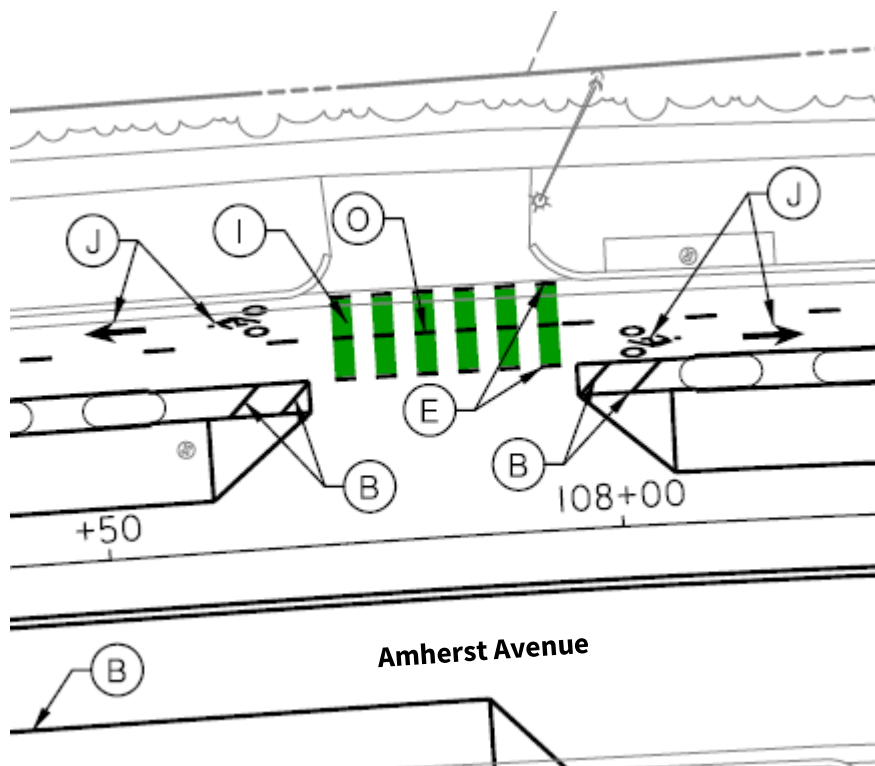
Break in concrete barrier for driveway (light grey lines reflect existing conditions, dark lines represent proposed changes)
